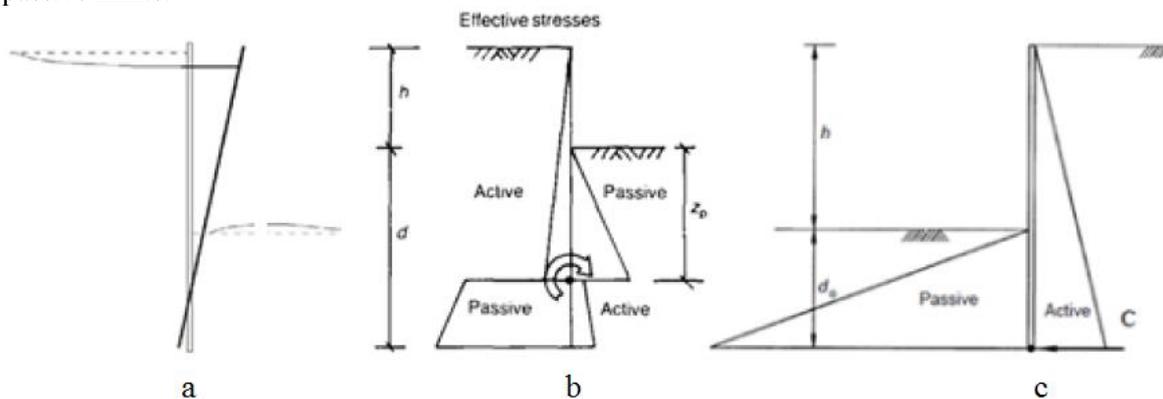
; a. Example of Failure Mechanism in Limit Mode for Rotational Failure of a Cantilever Embedded Retaining Wall (Sigström and Persson, 2010), b. Equilibrium Stress Distribution of a Cantilever Retaining Wall at Limit Equilibrium (Bolton & Powrie, 1987), c. Simplified Pressure Distribution of a Cantilever Wall (California Dept. of Transportation, 1995)
